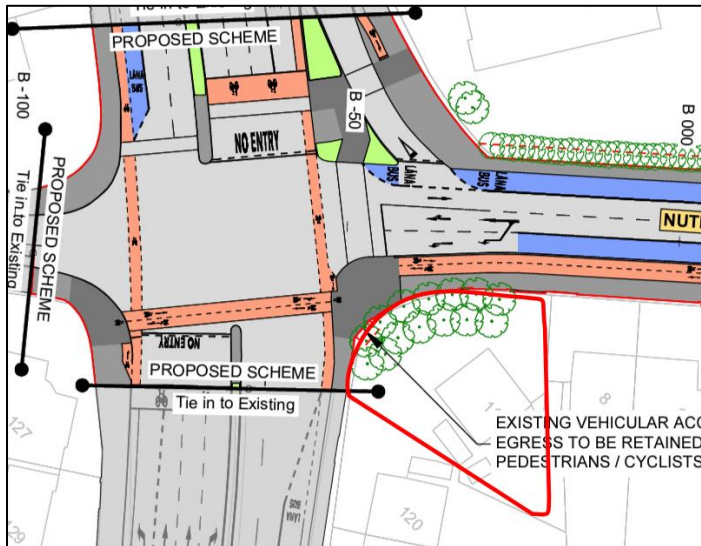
Proposed new Layout at 118 Stillorgan Road
